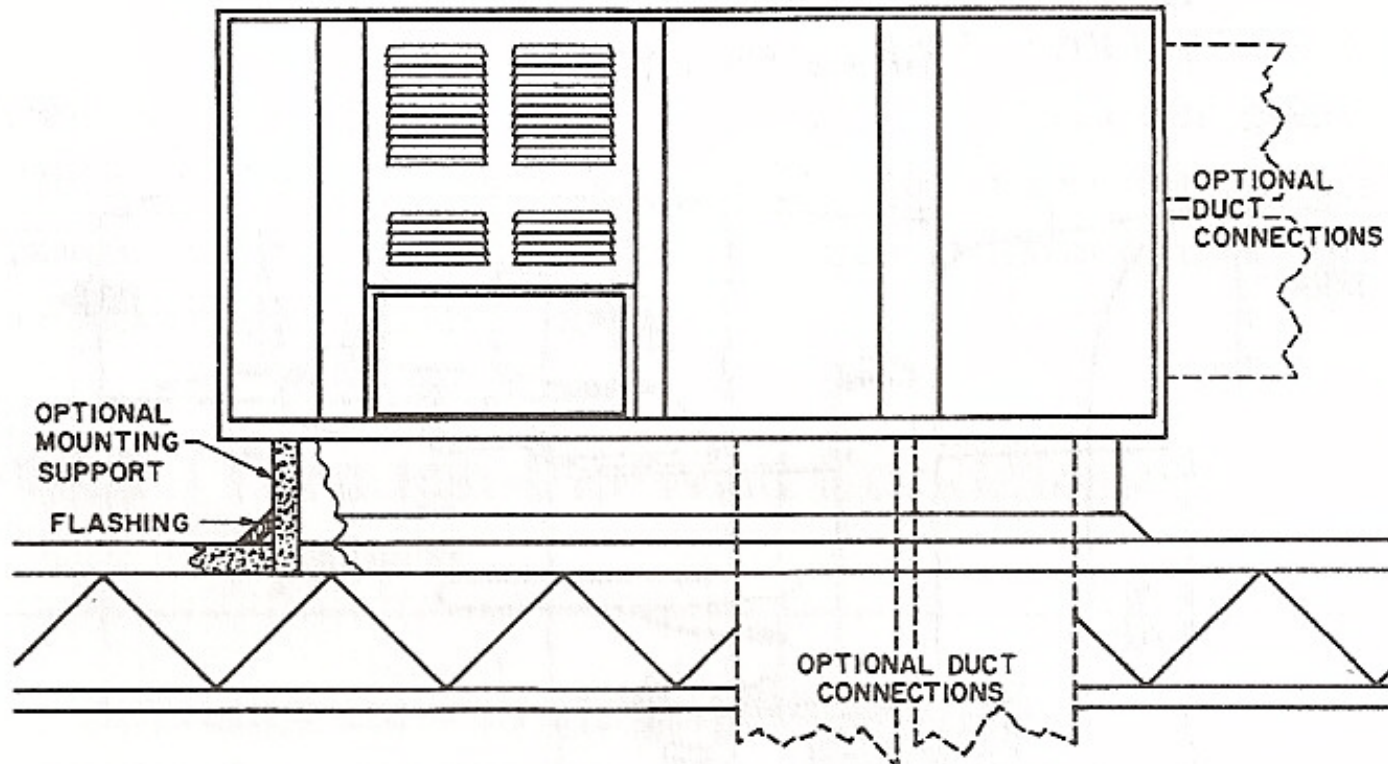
Rooftop Installation of a Single-Package Unit
